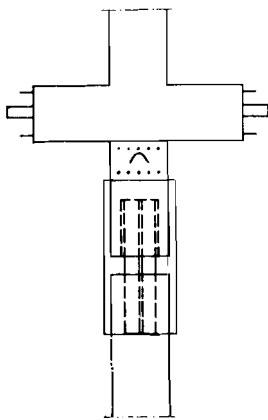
Column being jointed. The mould also serves to hold the column parts in position during jointing.
